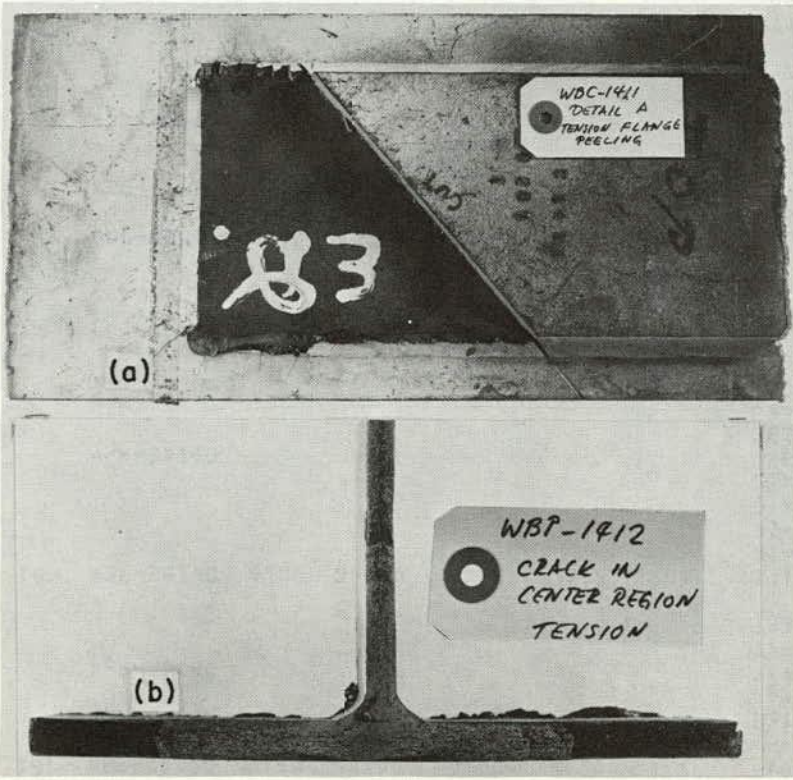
Typical crack types. (a) peeling cover-plate crack, designation type P; (b) intersecting flange-web crack, designation type I.
